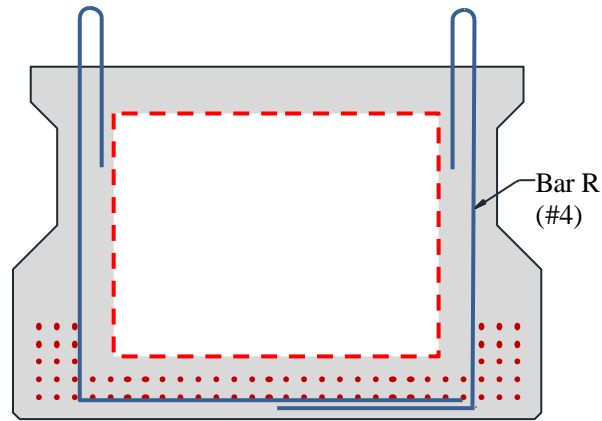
Shear reinforcement bars and strand pattern for 5XB40 box beams.
